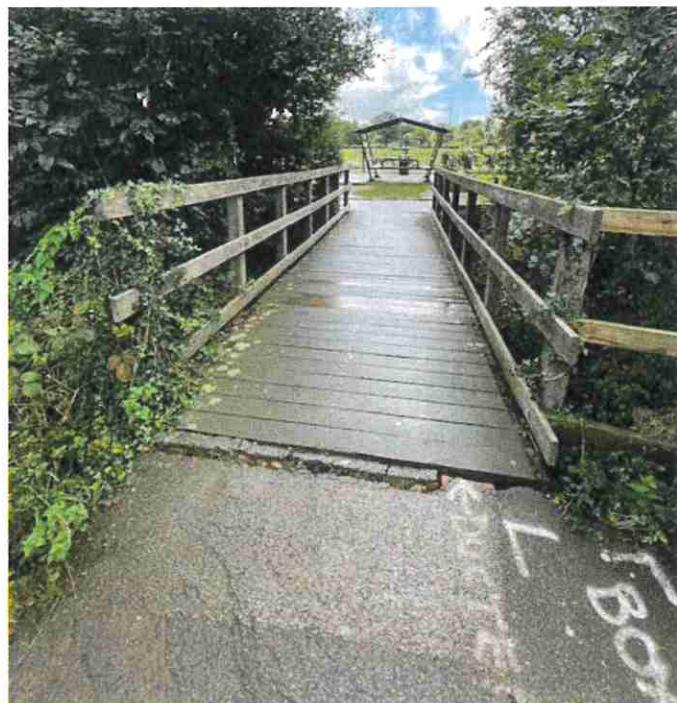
Existing bridge looking south towards the Snoxhall Fields, showing the tarmac pavement cracking at abutment with the bridge
